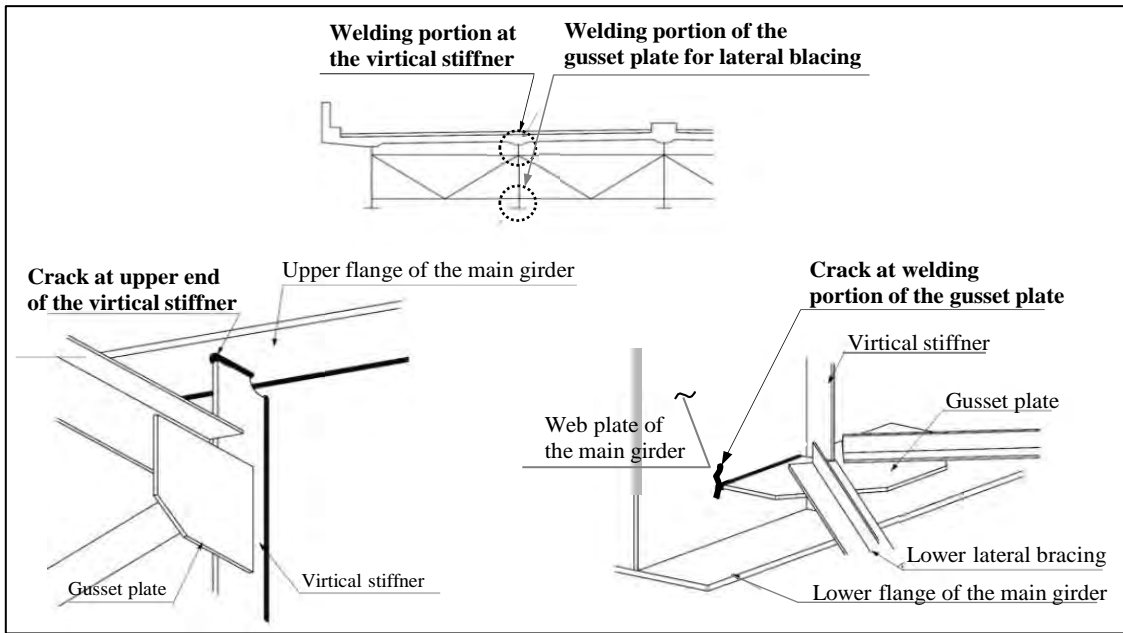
Crack at Welding Portion at the Vertical Stiffener
